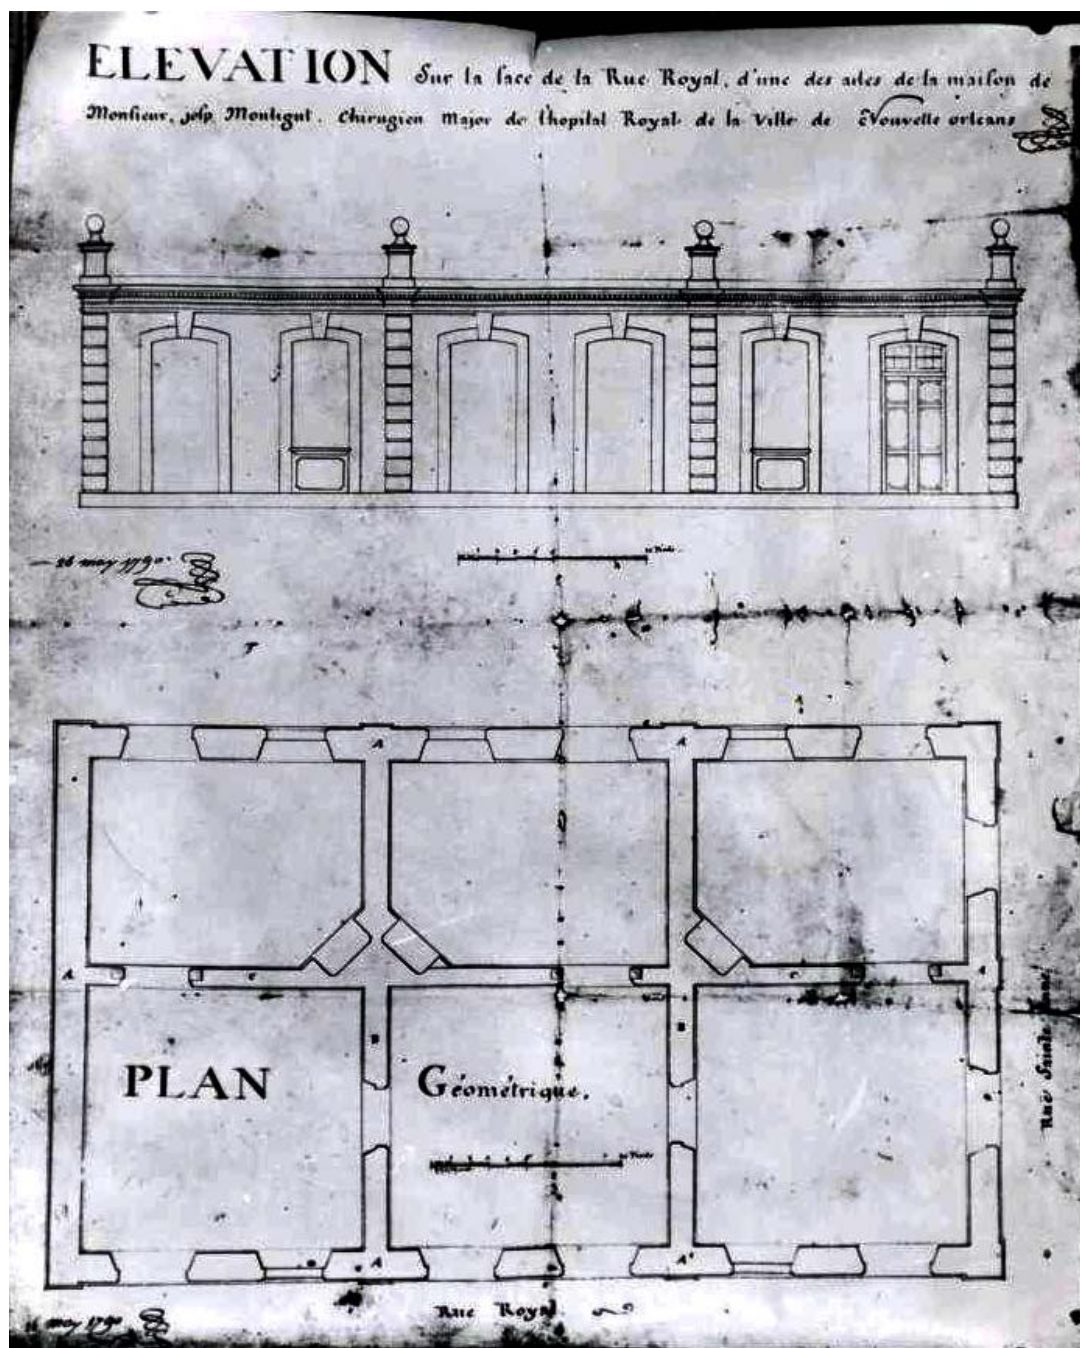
735-741 Royal Street. A plan for an expansion of the The Joseph Montegut house at the corner of Royal and St. Anne Streets. This semi-double plan was signed by Gilberto Guillemard, experienced in Spanish colonial neoclassical styles. A portion of the façade of this expansion is seen on the right side of the image in Fig. 5.5. HNOC.
